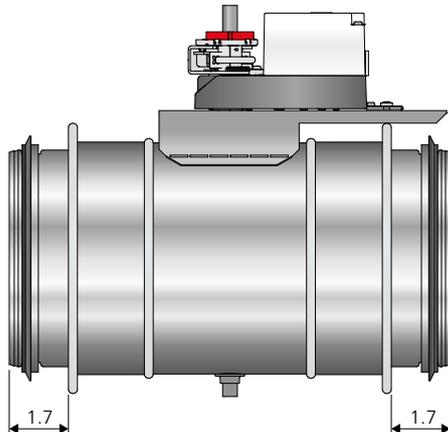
Dimensions (in), REACT PX GMB circular with DUCT ADAPTER installed.
